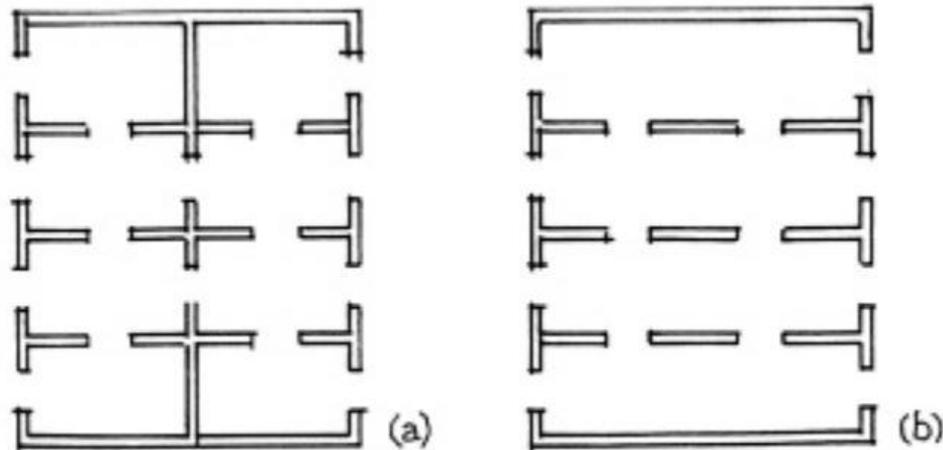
Distribution of walls in plan (a) adequate – (b) not adequate.
